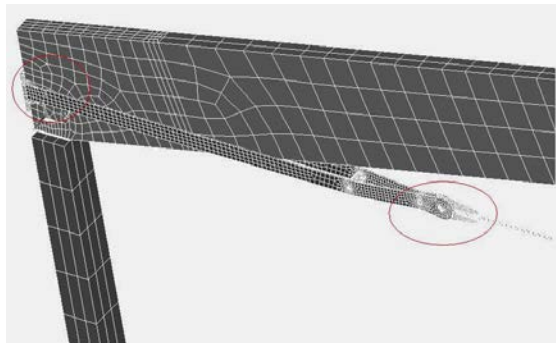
Detail of the finite element grid: the tie + glue lam timber structure
